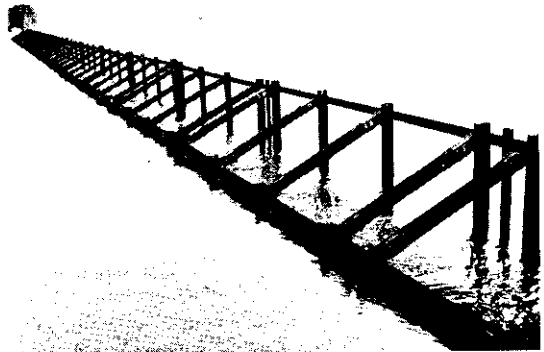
Simplified steel blocks settled in the sea (K·H C type)
